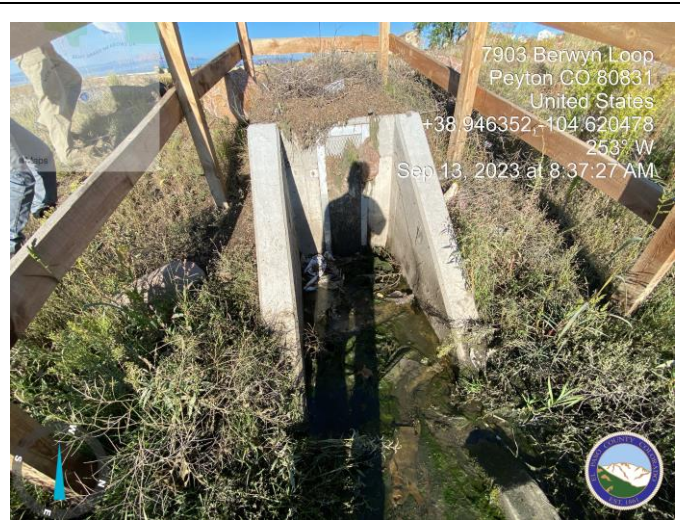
(South Pond) Outlet structure inspection could not be completed because of amount of debris covering it. The PA inspection will be completed once debris is removed.
